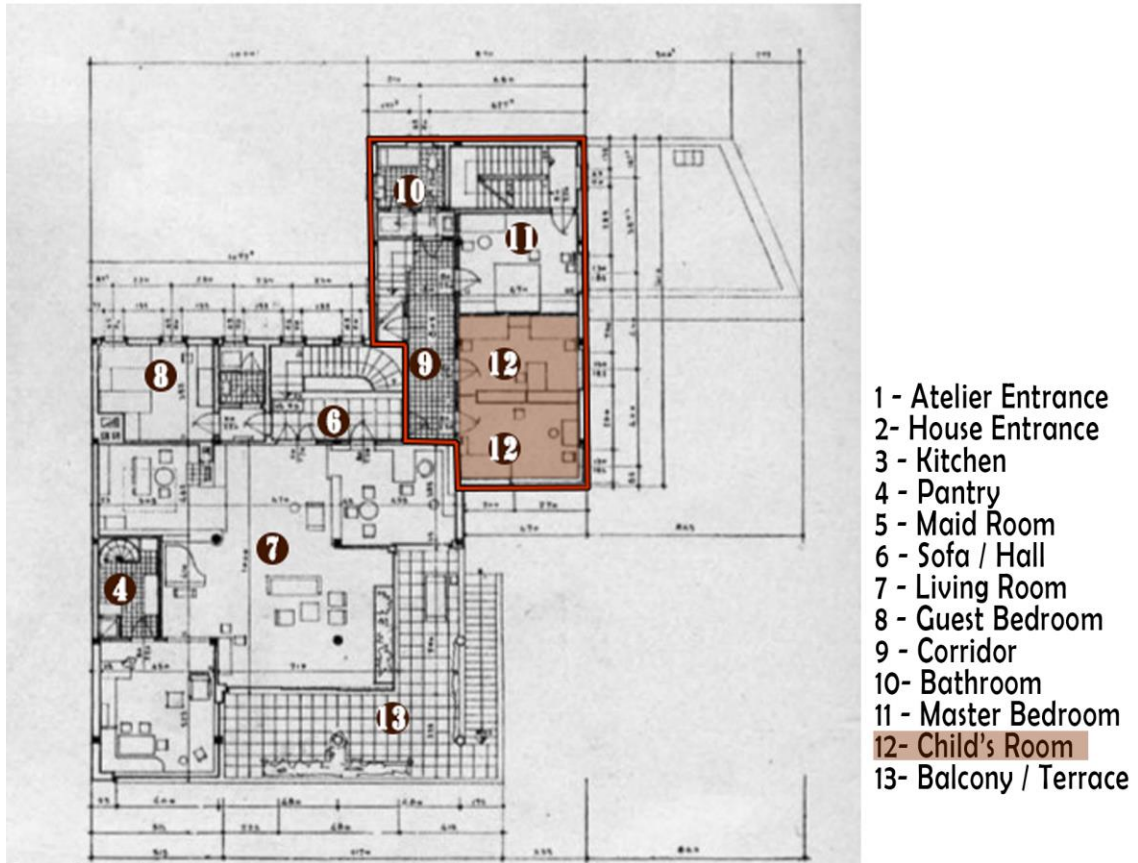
The first floor plan of a beach house (*Mimarlık*, 1933, 11)
